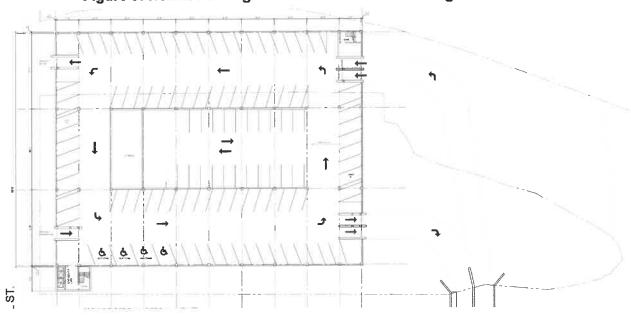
Hewitt Parking Structure Two Access Design Alternative
